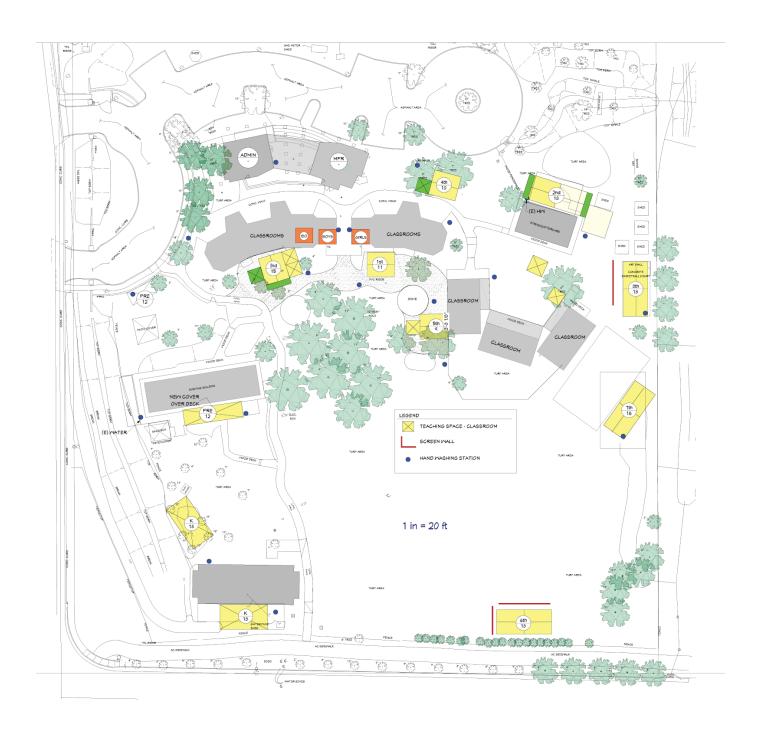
Outdoor classrooms and handwashing stations are indicated on this map.
